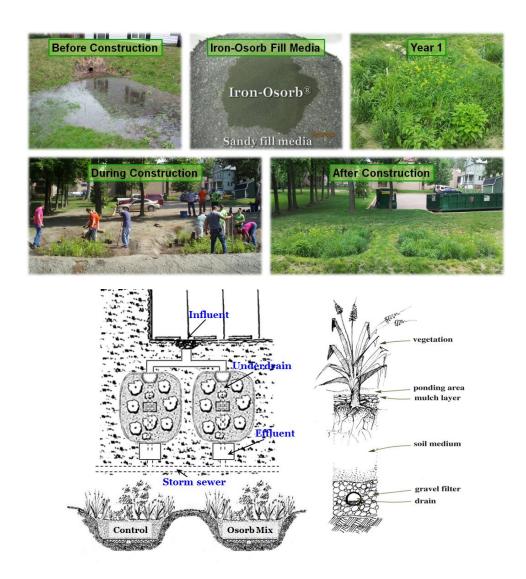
Site, plan, and cross-section views of field-scale bioretention systems (rain gardens) installed at the campus of the College of Wooster, Ohio. One standard model and one version enhanced with Fe-Osorb.
